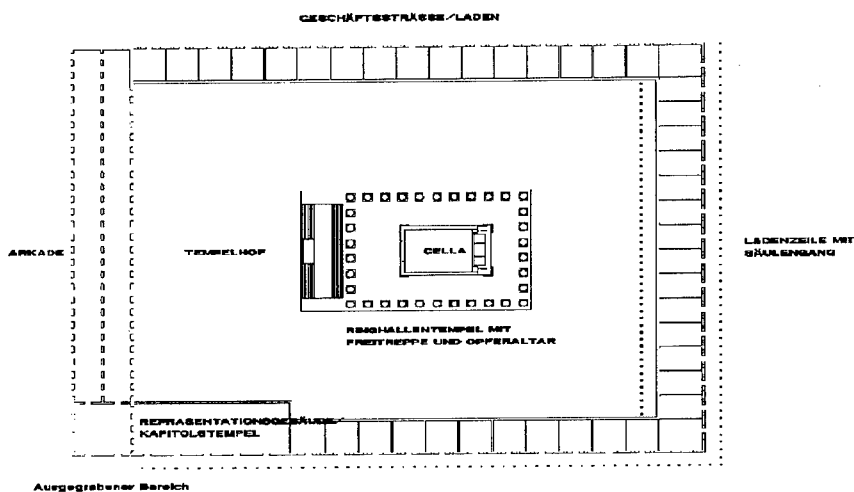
The capitoline temple: Floor plan with shaded excavated area
